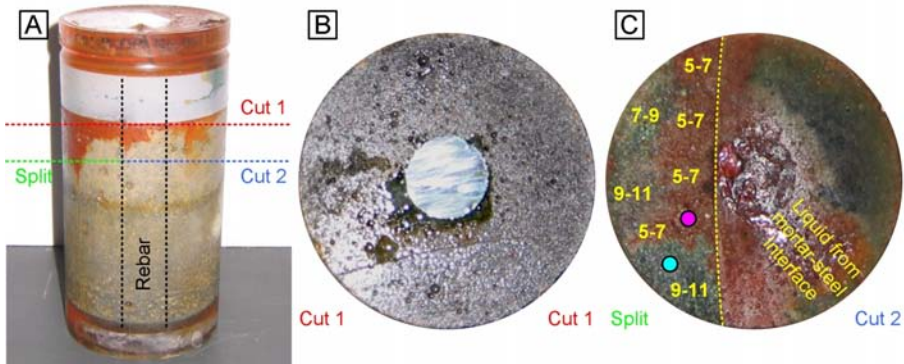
[A]: Severely corroded (chloride induced) mortar specimen with central grit-blasted carbon steel rebar without embedded ‘EEW’ (specimen “C01-B”, cf. Section 1.9.4) at the end of its exposure period (lead wires and O-ring removed). Identification of rebar position and of sawn face (cut 1, red) and sawn/split face (cut 2/split, blue/green). [B]: Fresh sawn face corresponding to cut 1 line with ‘GR1’ protruding from the mortar-steel interface. [C]: Sawn/split face with Rainbow indicator applied (cf. Section 3.1.7.2). Ranges of pH (yellow numbers) indicated on split face in accordance with the colour code of the rainbow indicator (cf. Table 3.3 in Section 3.1.7.2). Identification of measurement points used for element mapping, i.e. pink dot in low pH area (cf. Figure 5.15 and Figure 5.16) and turquoise dot in high pH area (cf. Figure 5.17).
